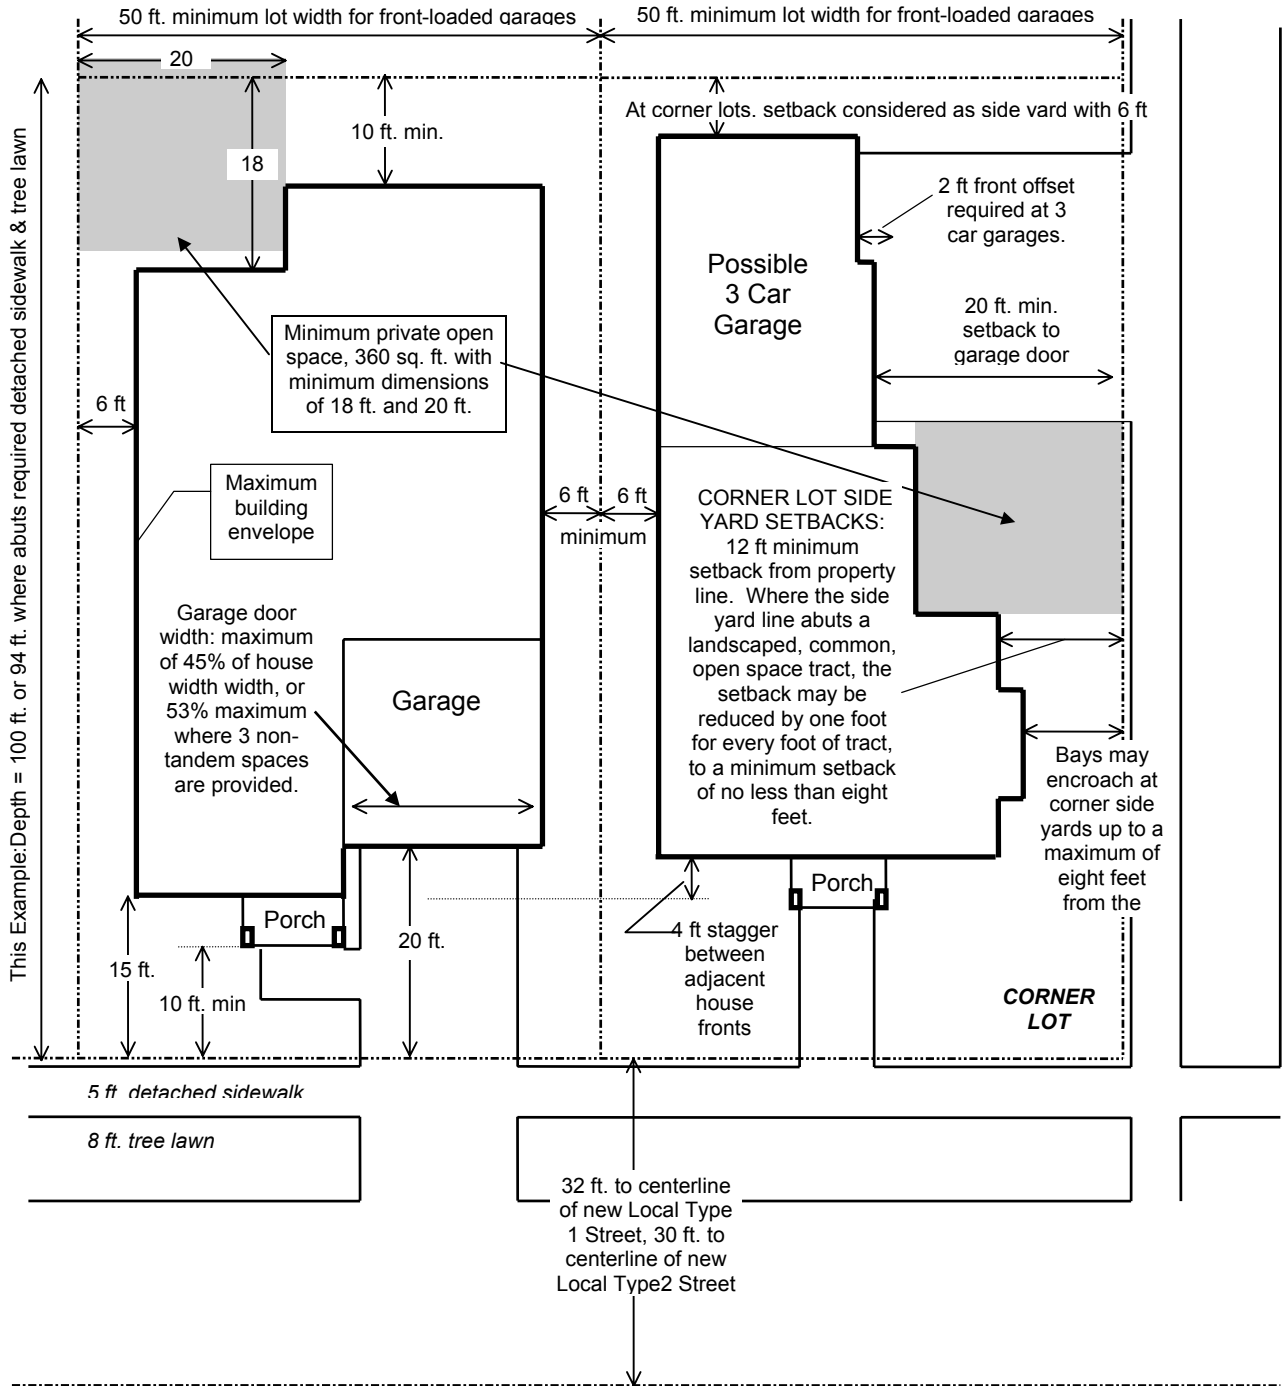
Dimensional Standards for Small Lots with Front Loaded Garages Located in Rear Yards
